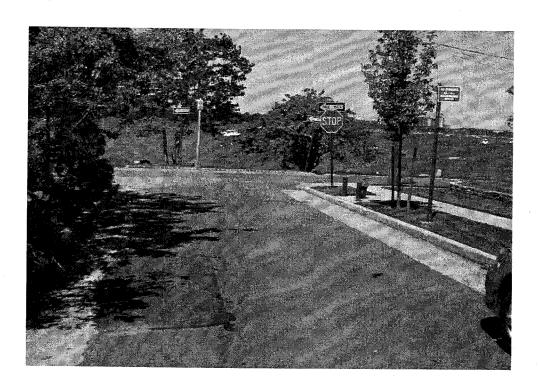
View westward down Westmoreland Place toward the Shore Road intersection.
